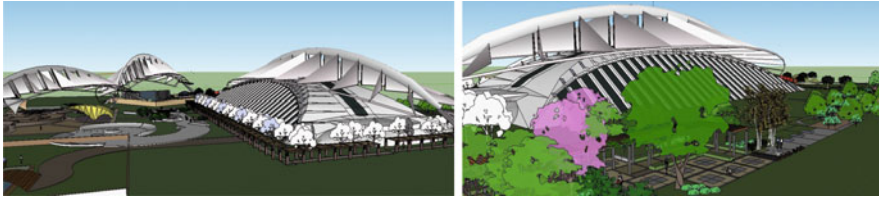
Exterior views of the School of Engineering, Thulasi B. Arch 2011
